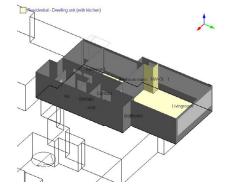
Using virtual zones for defining seprate ventilation settings in one room.
